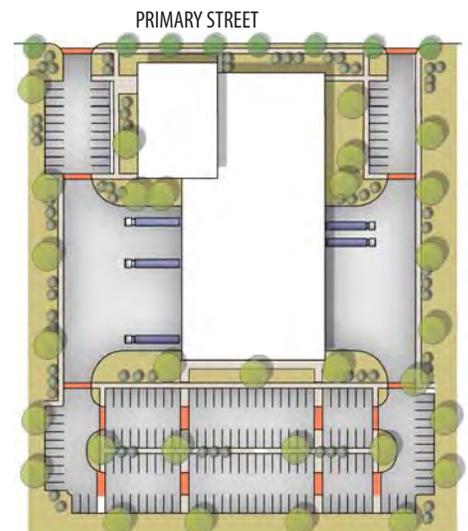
Exhibit H: Diagram illustrating maximum parking frontage for retail/ office uses, pedestrian pathways through the parking lot, and water harvesting areas located along the parking perimeter and parking medians
